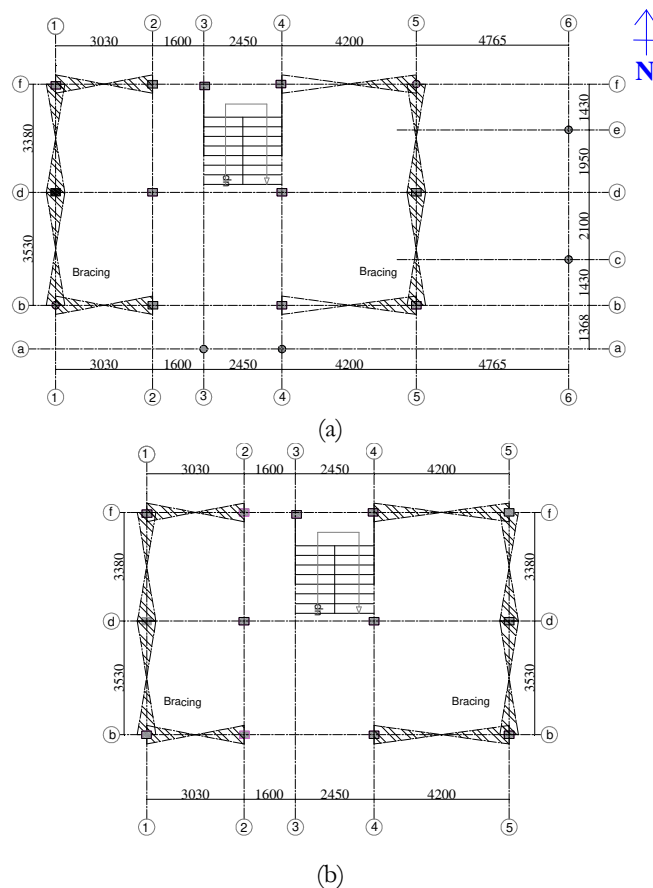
Bracing layout in the MRT1-WO-GI building; (a) Ground and first floors, (b) Second floor (all dimensions are in mm)
